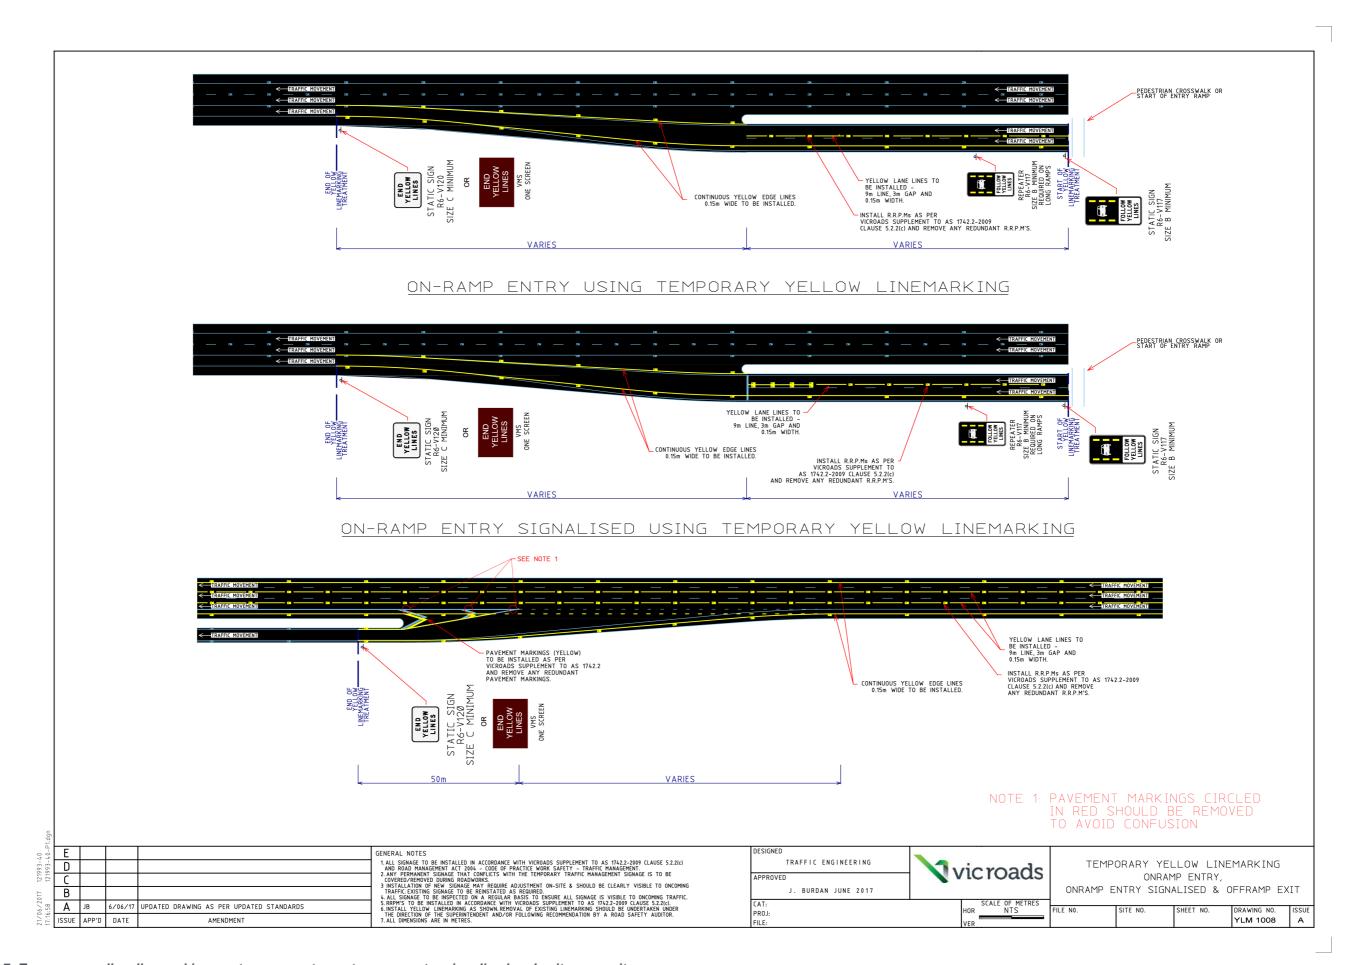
Temporary yellow linemarking - entry ramp entry, entry ramp entry signalised and exit ramp exit
